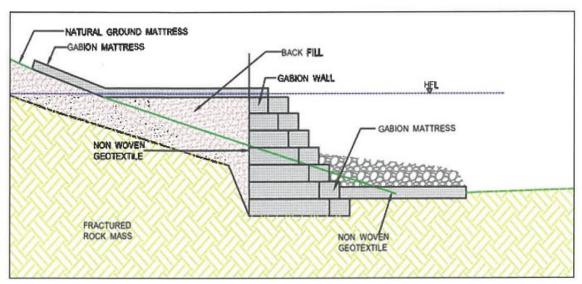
Cross-section of Gabion Retaining Wall with Launching Apron on River Bed
